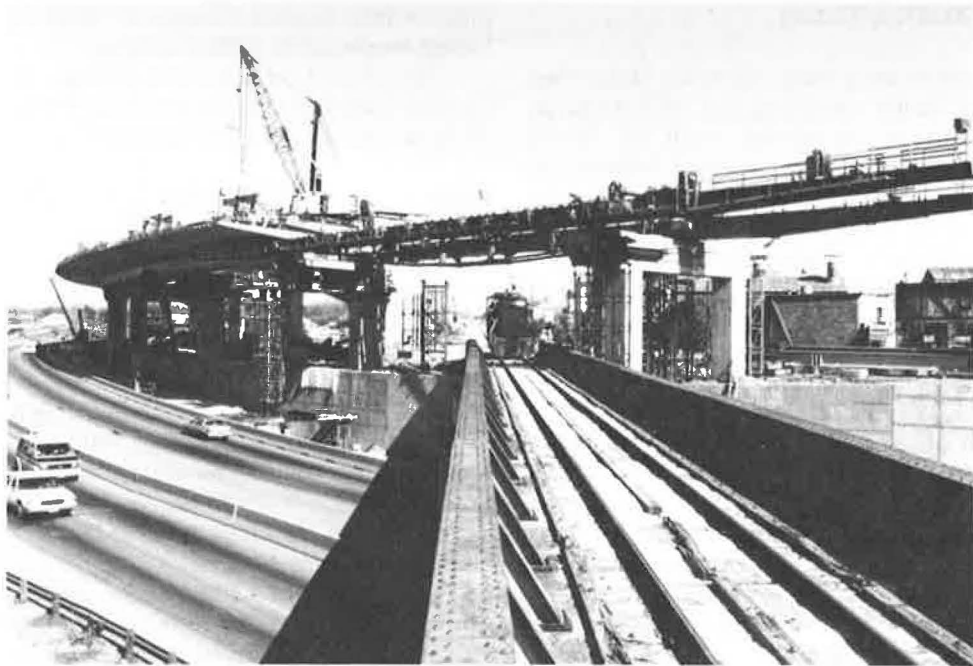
San Antonio "Y". Project IIIA&B construction over active rail lines. Construction from above eliminated traffic disruptions.
